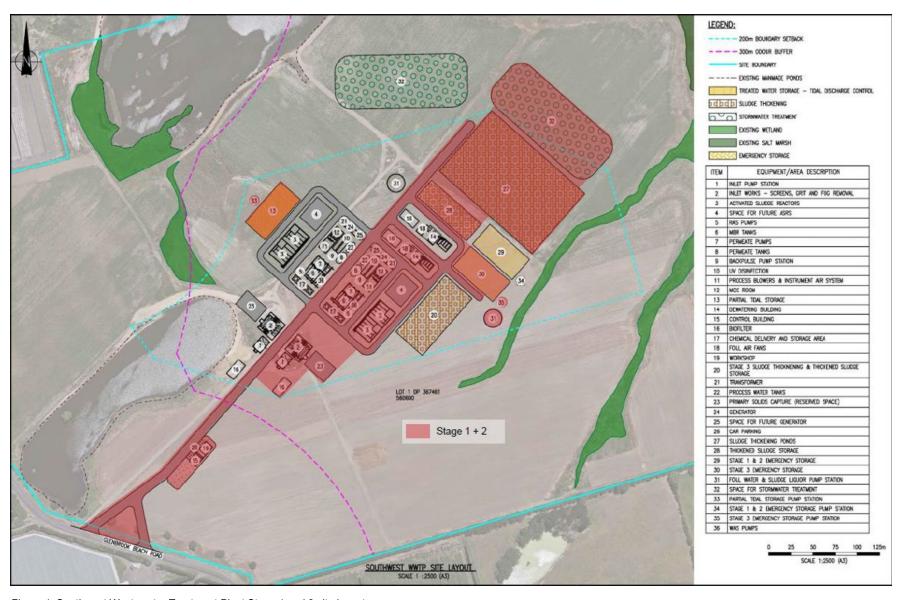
Southwest Wastewater Treatment Plant Stage 1 and 2 site layout
